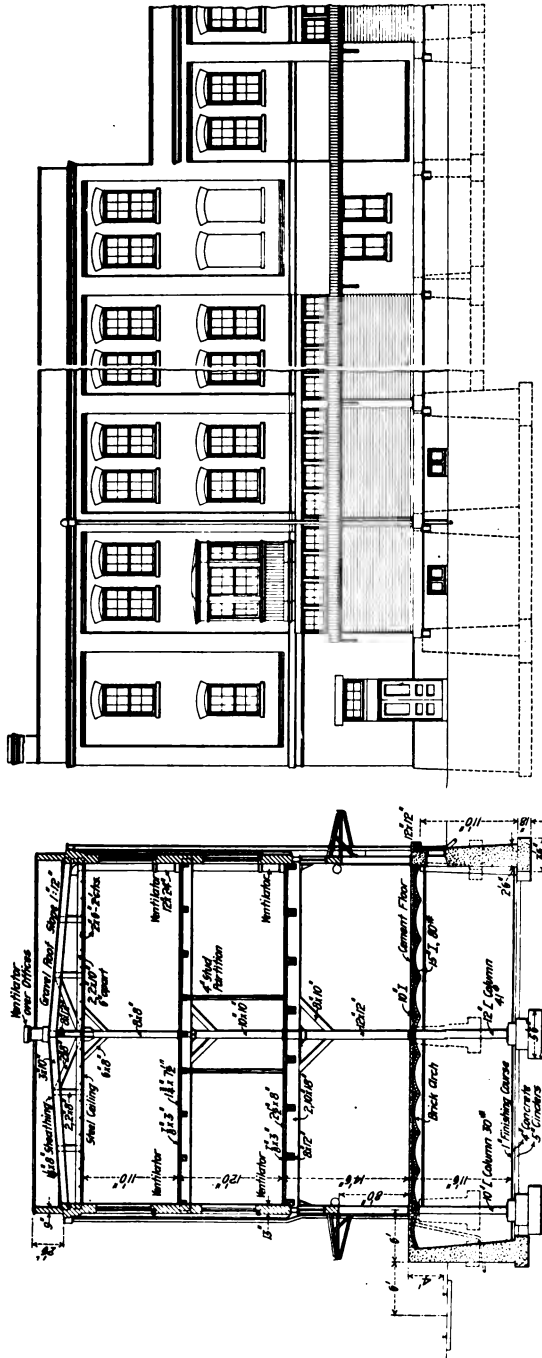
Part Side Elevation and Cross-Section Through Office Portion of Wabash Inbound Freight House at St Louis.
